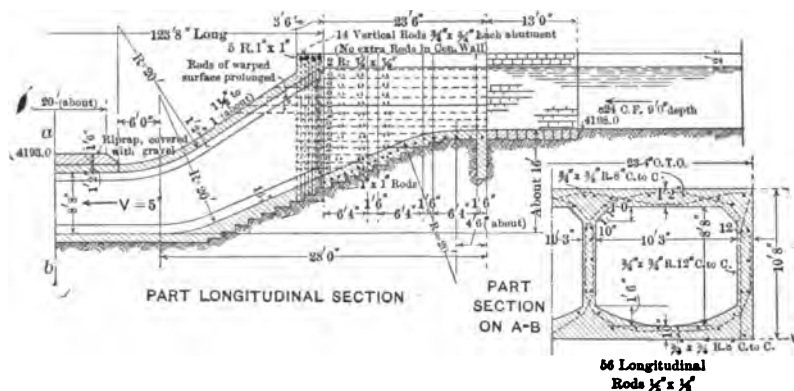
Reinforced Concrete Twin Siphon, Dry Spotted Tail Creek, Interstate Canal, Nebraska-Wyoming.
